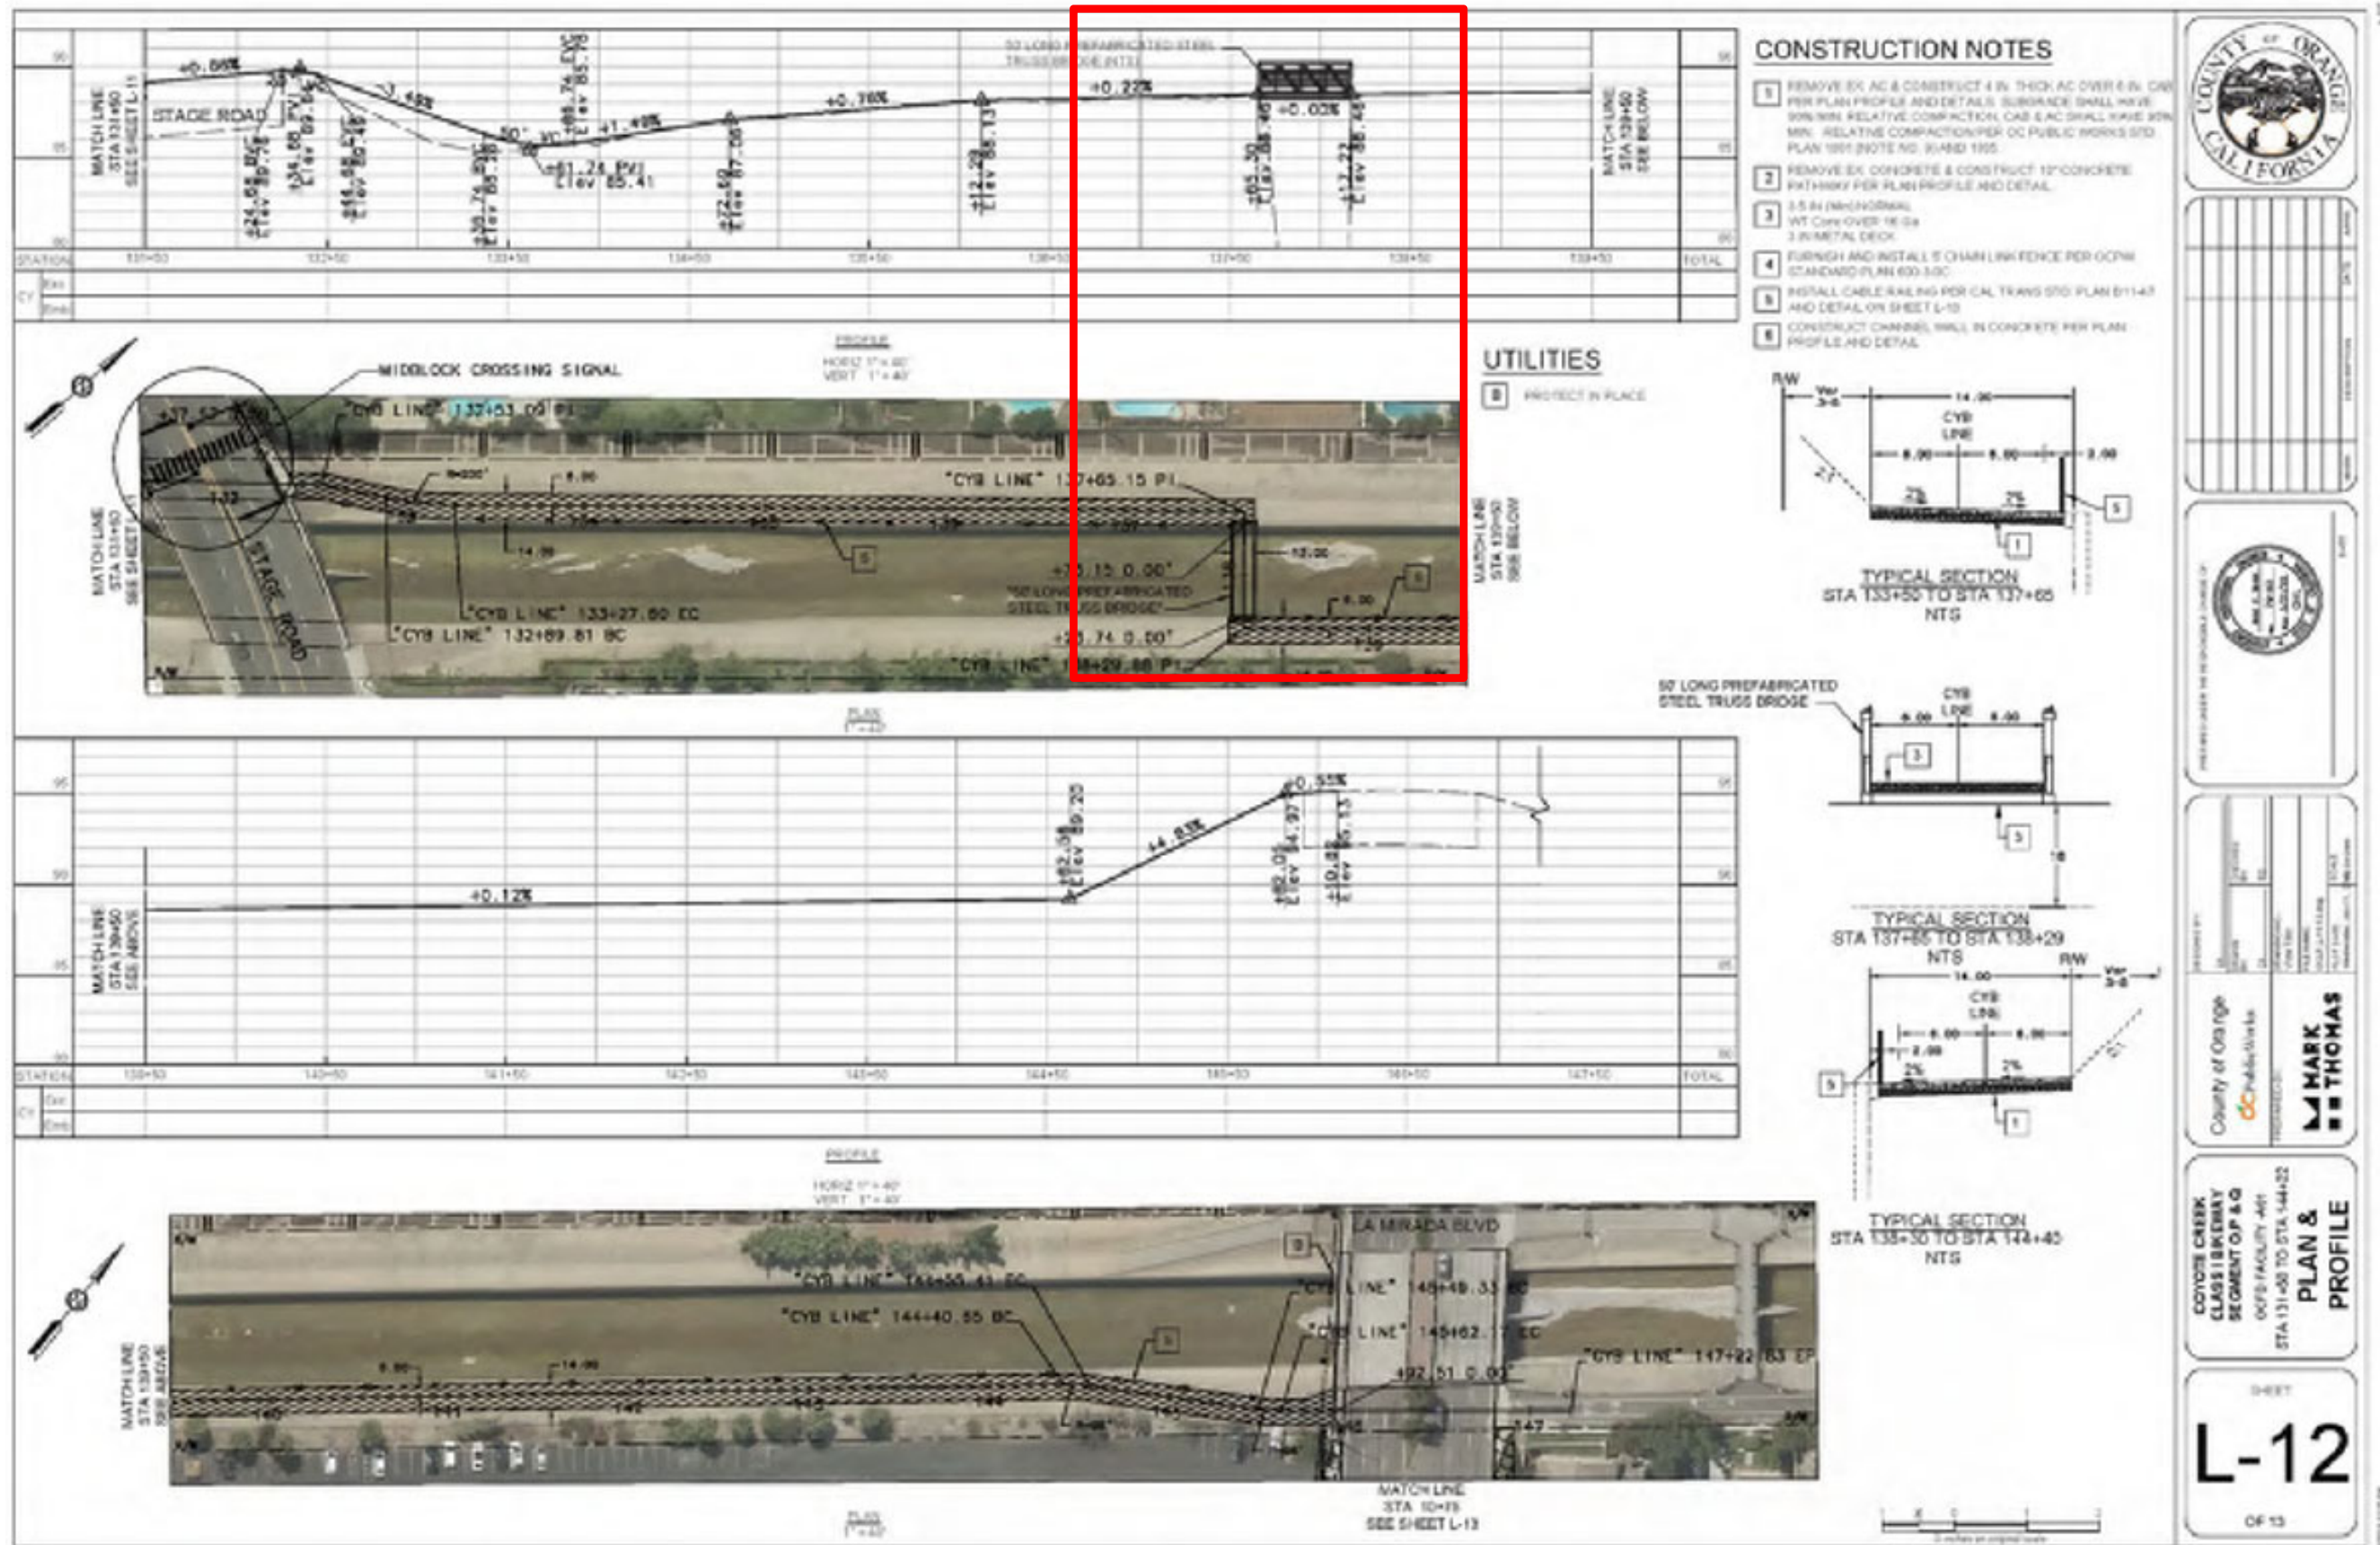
Bridge Location Map – Bridge #6: Coyote Creek 3 Bikeway Bridge
